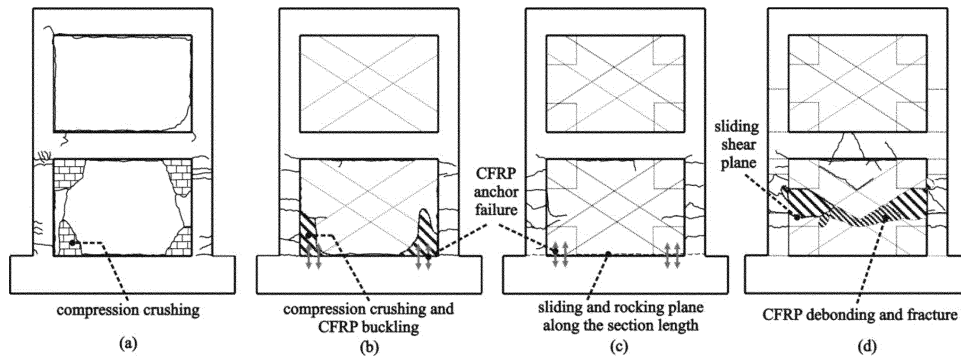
Observed damage after testing: (a) Specimen I; (b) Specimen IX; (c) Specimen IXF; and (d) Specimen IXFC.
